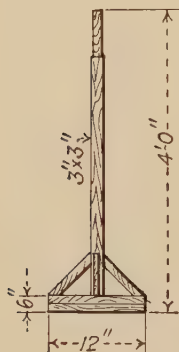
Wooden tamper for concrete in bottom of trench.
